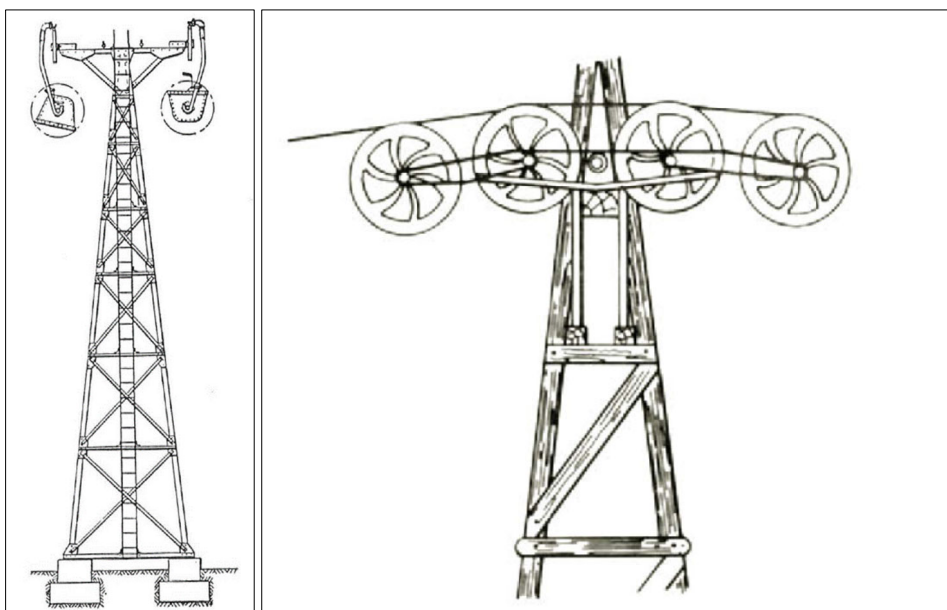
typical mono-cable trestle, left (Frenkiel 1969, 708) and sheave train, right (Walker 1988, 414)
